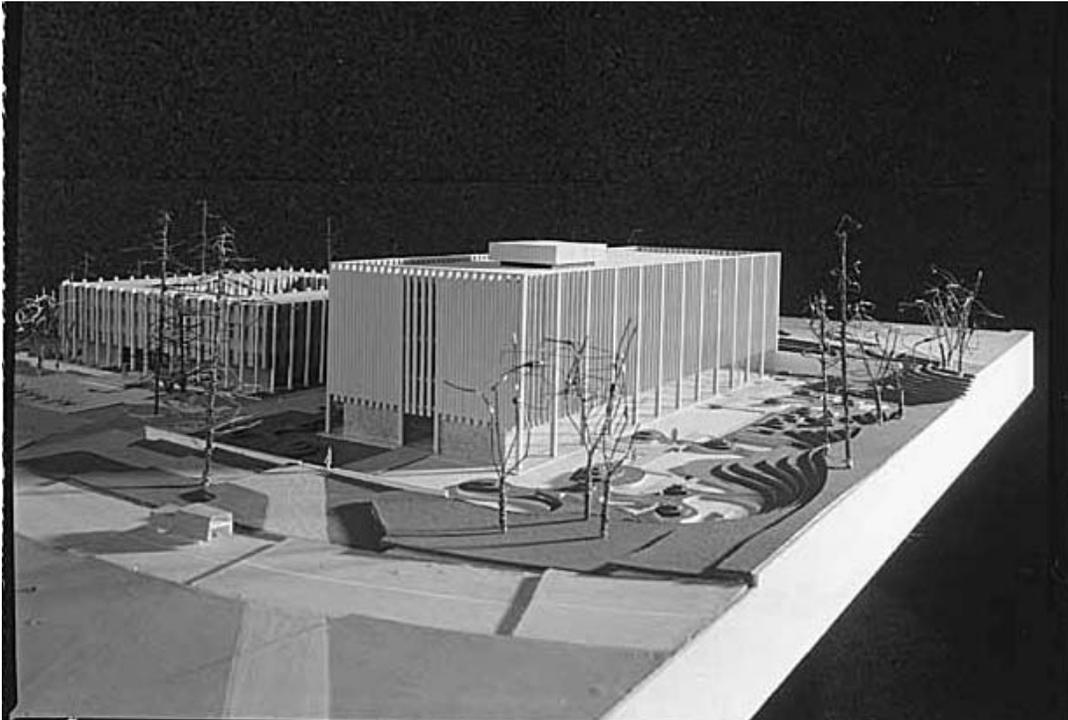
View looking southeast from Stevens Way, showing the primary north facade and an oblique view of the west facade.
